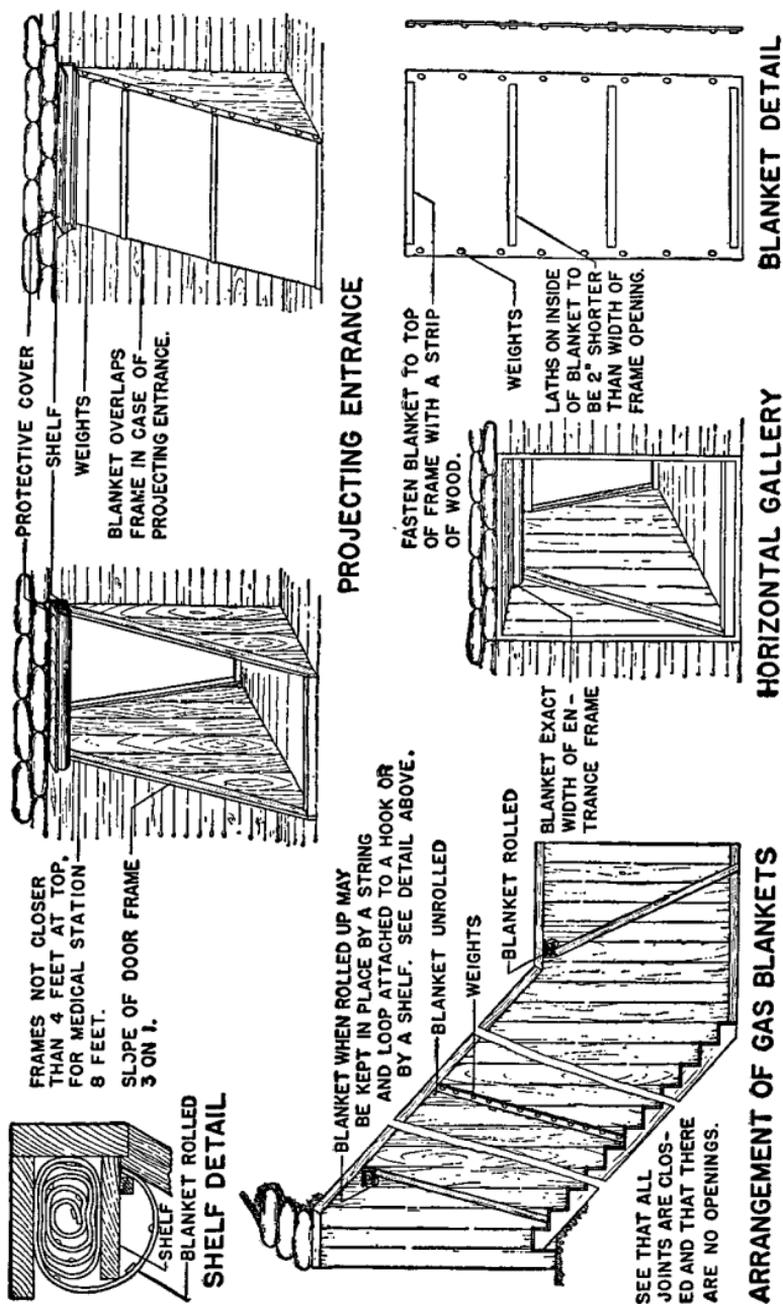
Typical arrangement for gasproofing dugouts.
